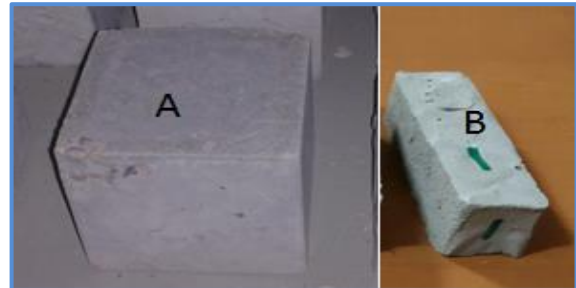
The specimens before testing: (A) concrete cubes (100x100x100) mm for compressive strength, and (B) concrete prisms (20x20x70) mm for flexural strength
